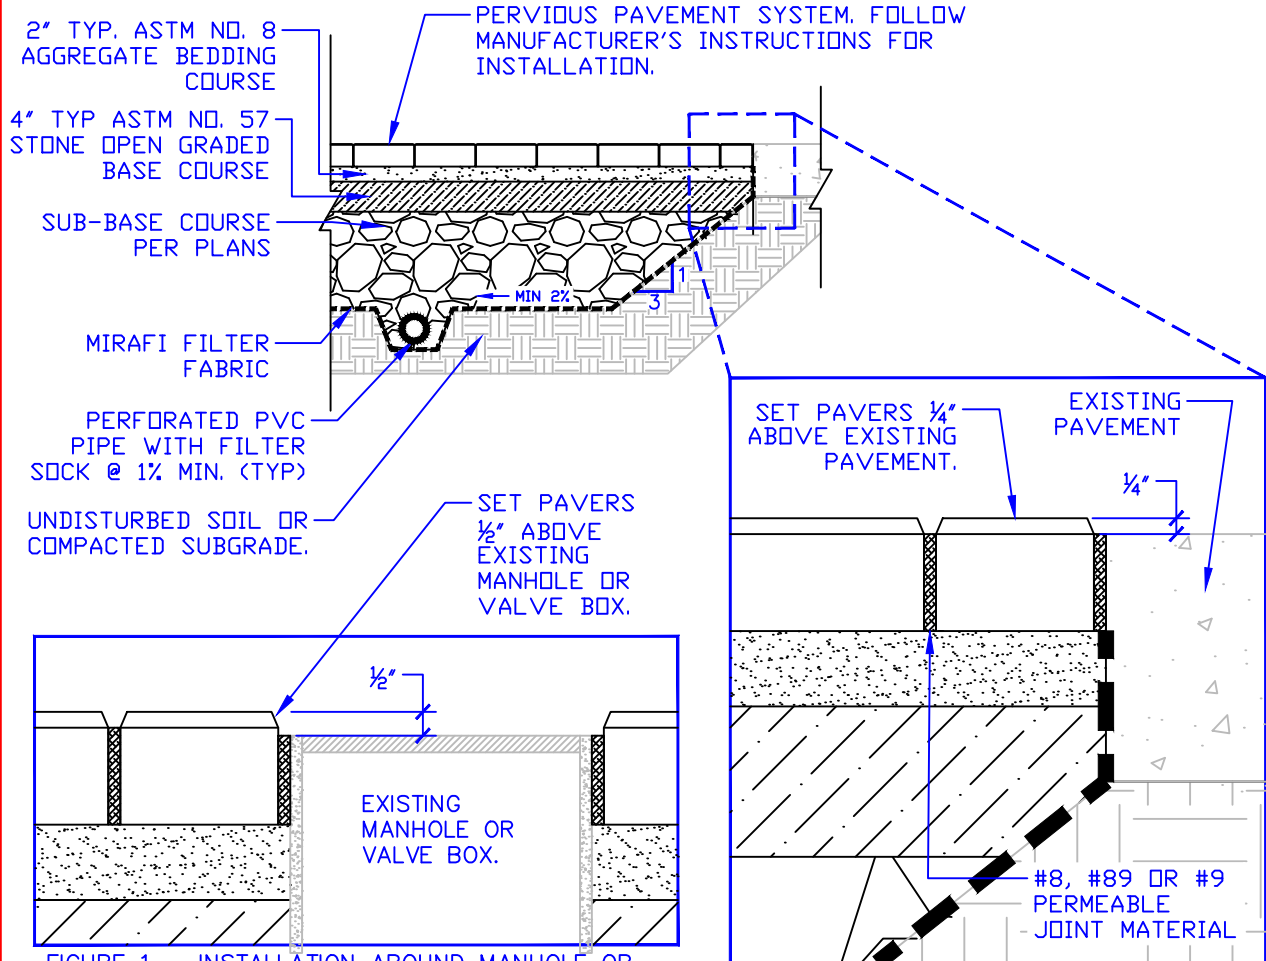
INSTALLATION AROUND MANHOLE OR VALVE BOX.
